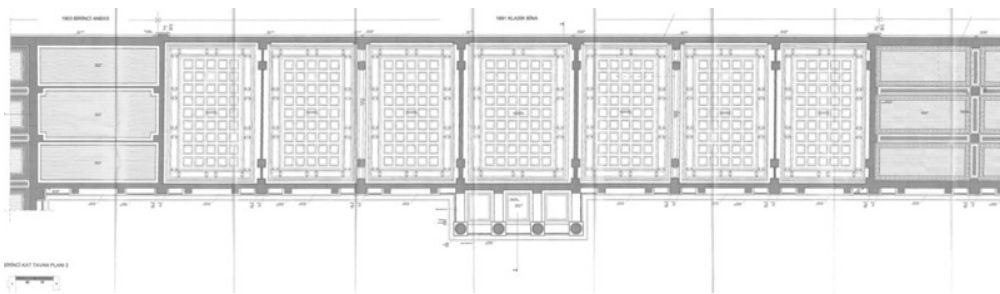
The restitution ceiling plan of first floor of 1<sup>st</sup> construction phase of IAM, drawn by *Seçkin Mimari Hizmetleri* (source: IDSM Archive)
